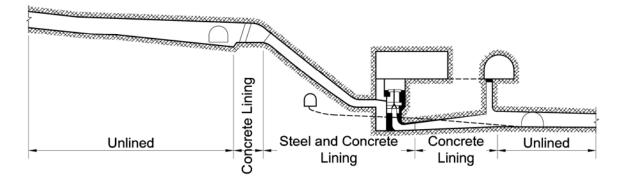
Downstream Surge Tank on Tailrace Tunnel
